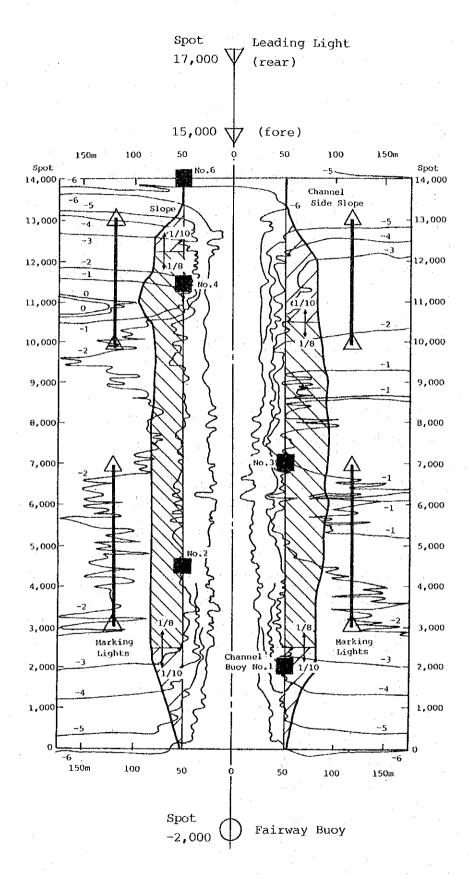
The First stage Plan of Navigational Aids Arrangement
